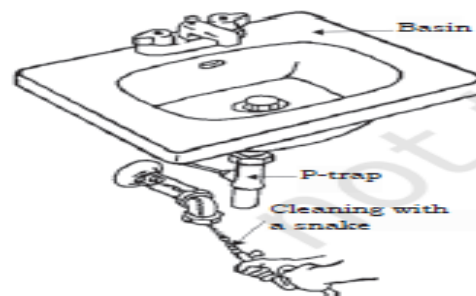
Clearing lavatory and sink stoppages beyond the p-trap
